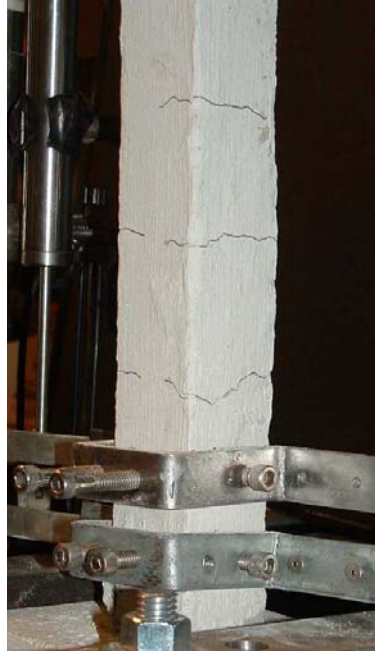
Column Cracking at Displacement 2 for Model Column Test M-5, 5-mm DHFRP Reinforced R/C Column.
